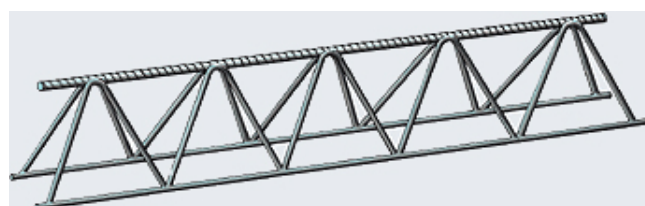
Typical steel lattice girder (Hanson Ltd, 2010)
